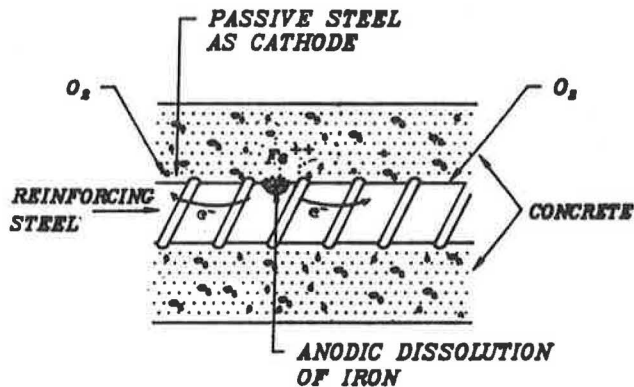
Schematic of corrosion of reinforcement steel in concrete.
